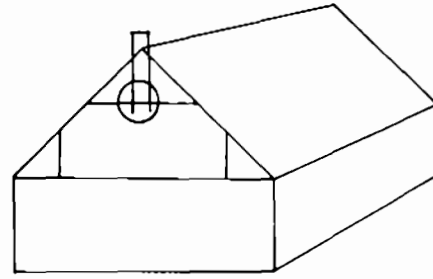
Detail E - Joint between column wall - intermediate joist structure.
